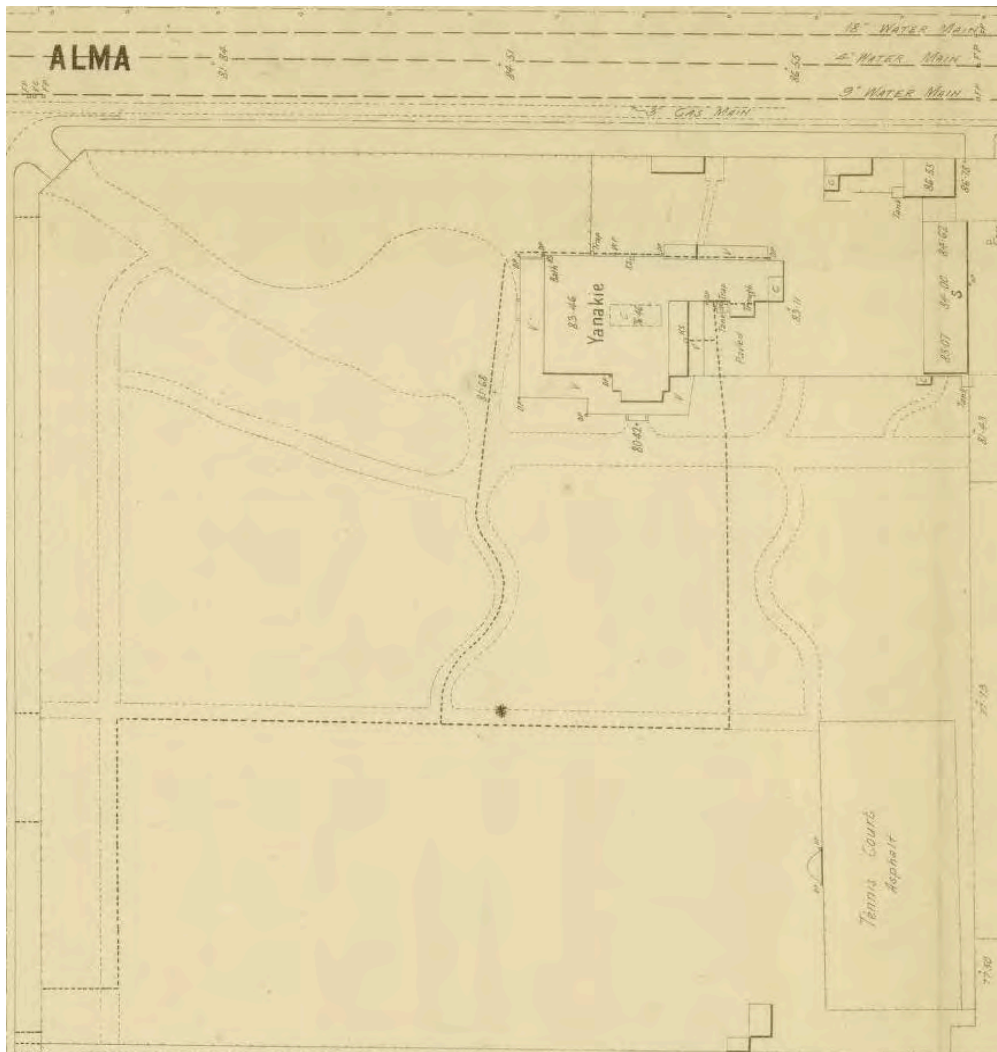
Extract of MMBW Detail Plan No. 1420 showing 'Yanakie' in 1900
